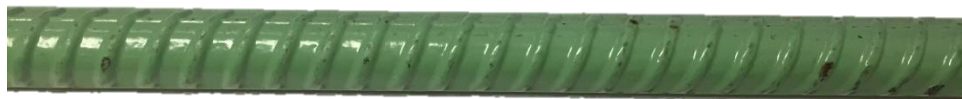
Deformed #5 (16 mm) Epoxy Reinforcement Bar
